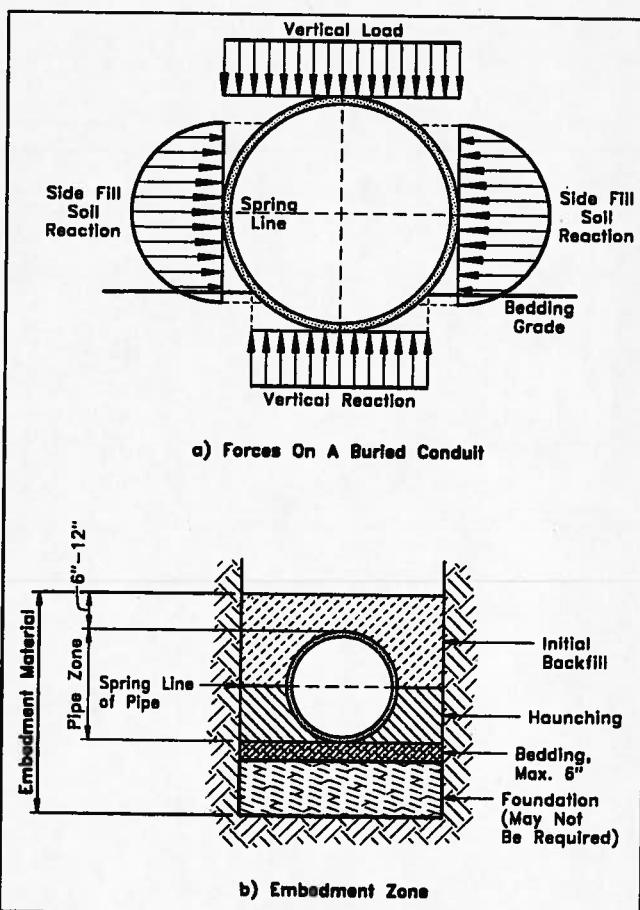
Forces on a buried conduit (a); Embedment zones (b). (Reprinted with permission from College of Engineering, Utah State University)
